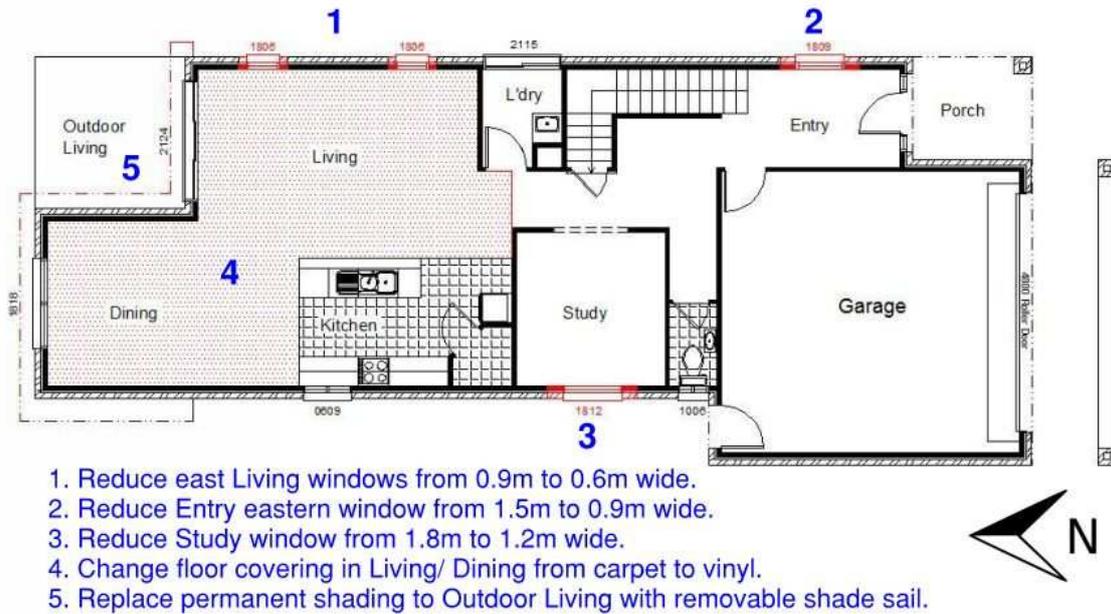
Redesigned ground floor plan of Dwelling 8 in Darwin.
